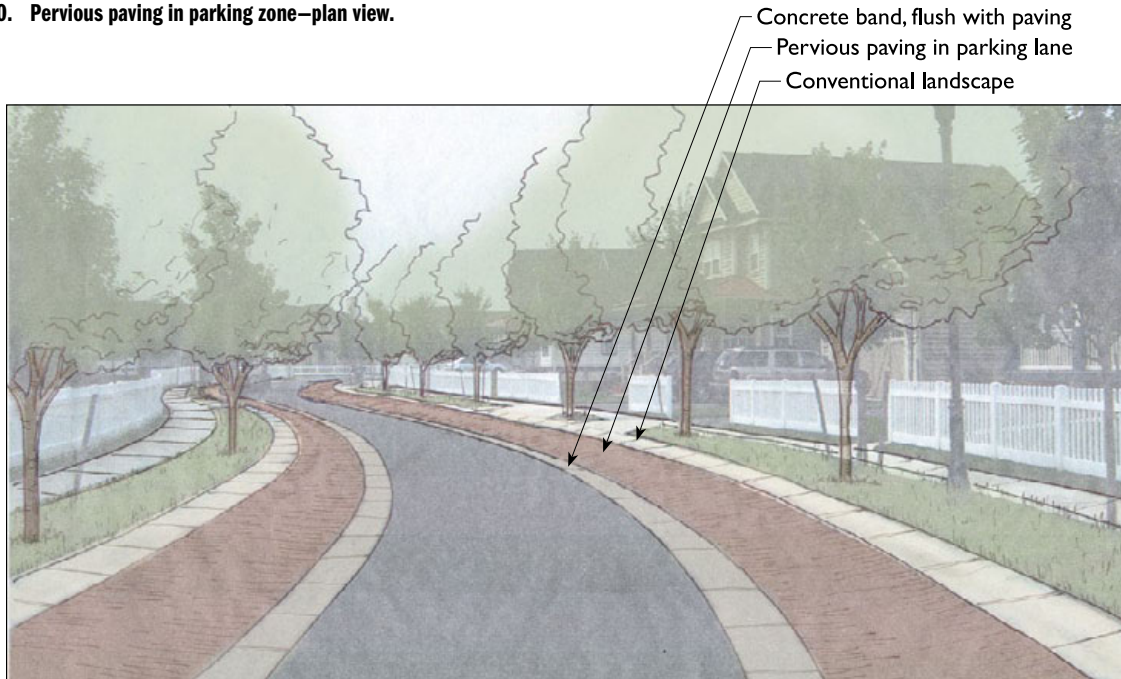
Retrofit potential:* Adding pervious paving on both sides of this residential street allows two-way travel and parking on both sides of the street.
